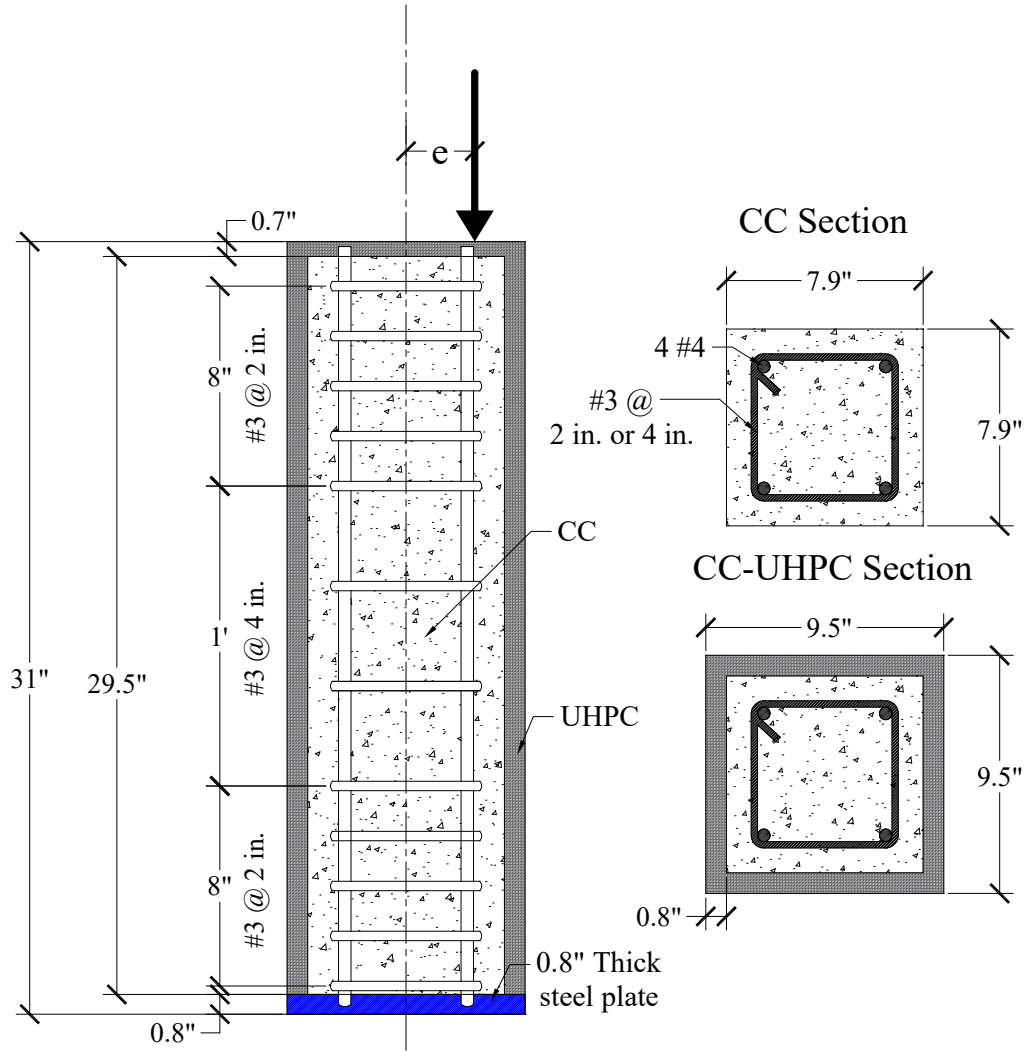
Geometry details of column specimen (Susilorini et al., 2023)
